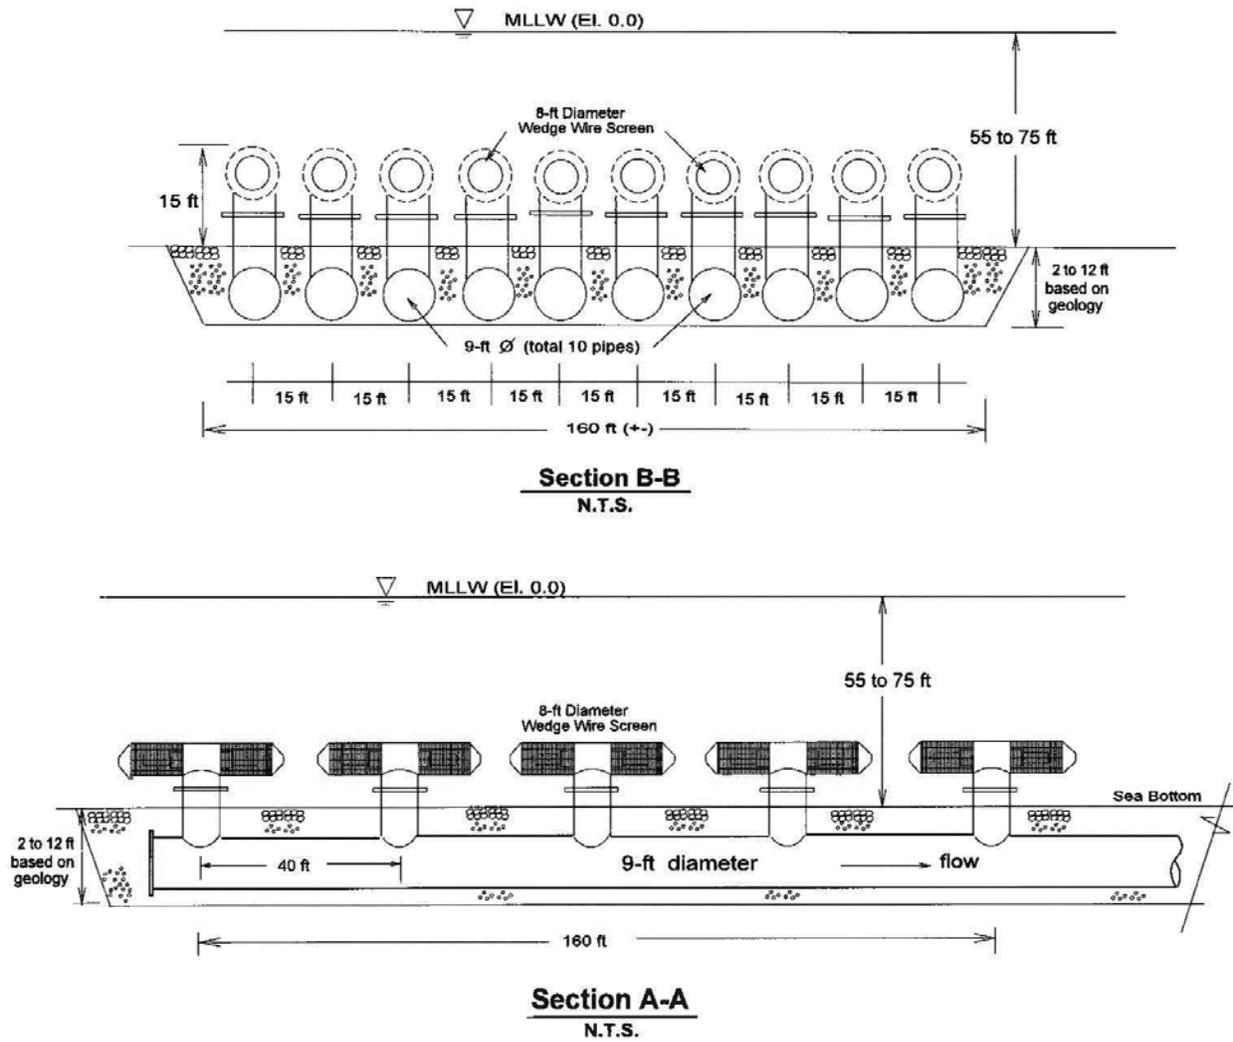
DCPP 2-mm-Slot Wedge Wire Screen Intake Assembly (Sectional Views)
